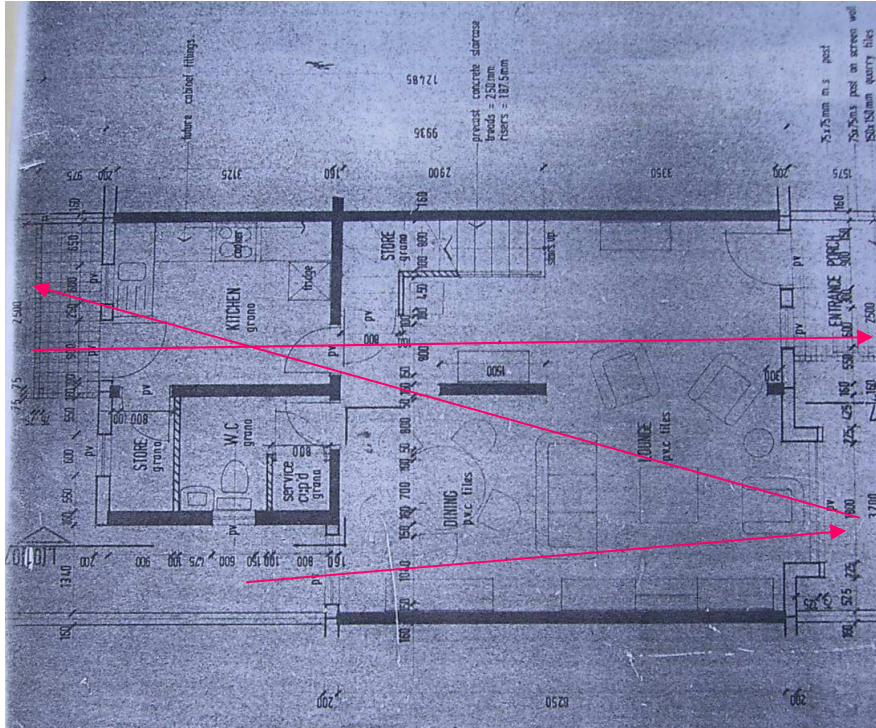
Maisonette Lighting and Ventilation
